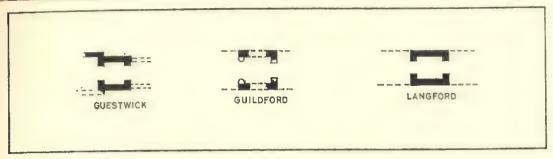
AXIAL TOWERS WITH INCOMPLETELY DEFINED CHURCH PLANS
